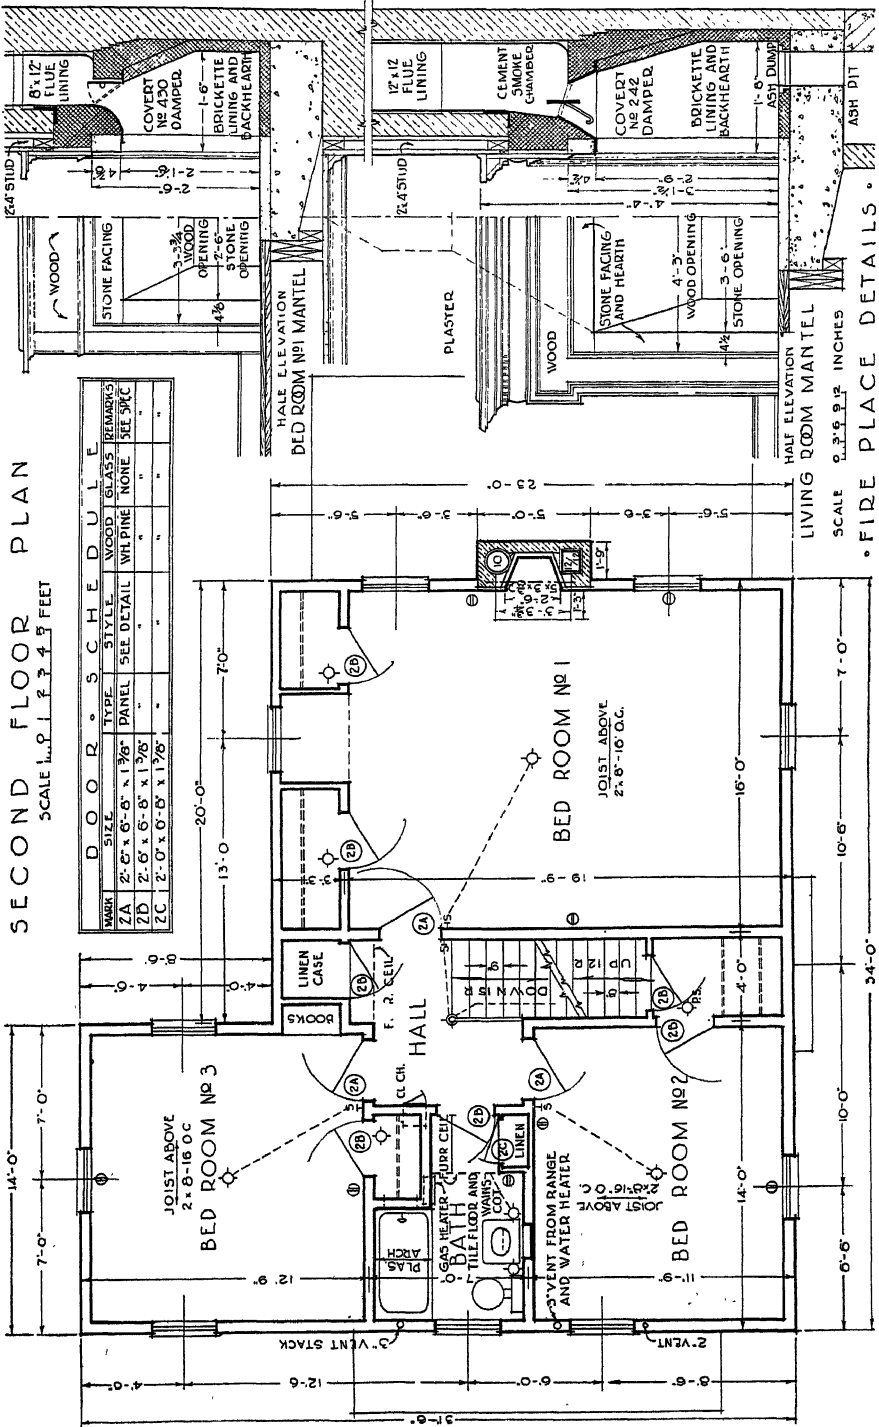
Working drawing; second floor plan and fireplace detail.
